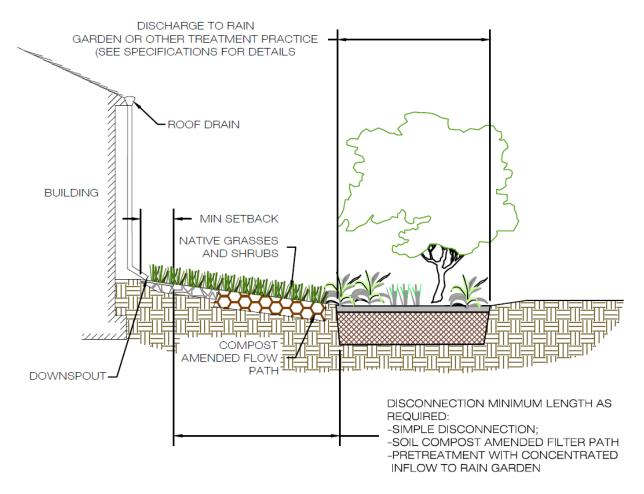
A. Residential Rooftop Disconnection – Section View: (a) Simple Disconnection to downstream Raingarden; (b) Disconnection – Alternative Practice: Compost Amended Flow Path to downstream Raingarden
